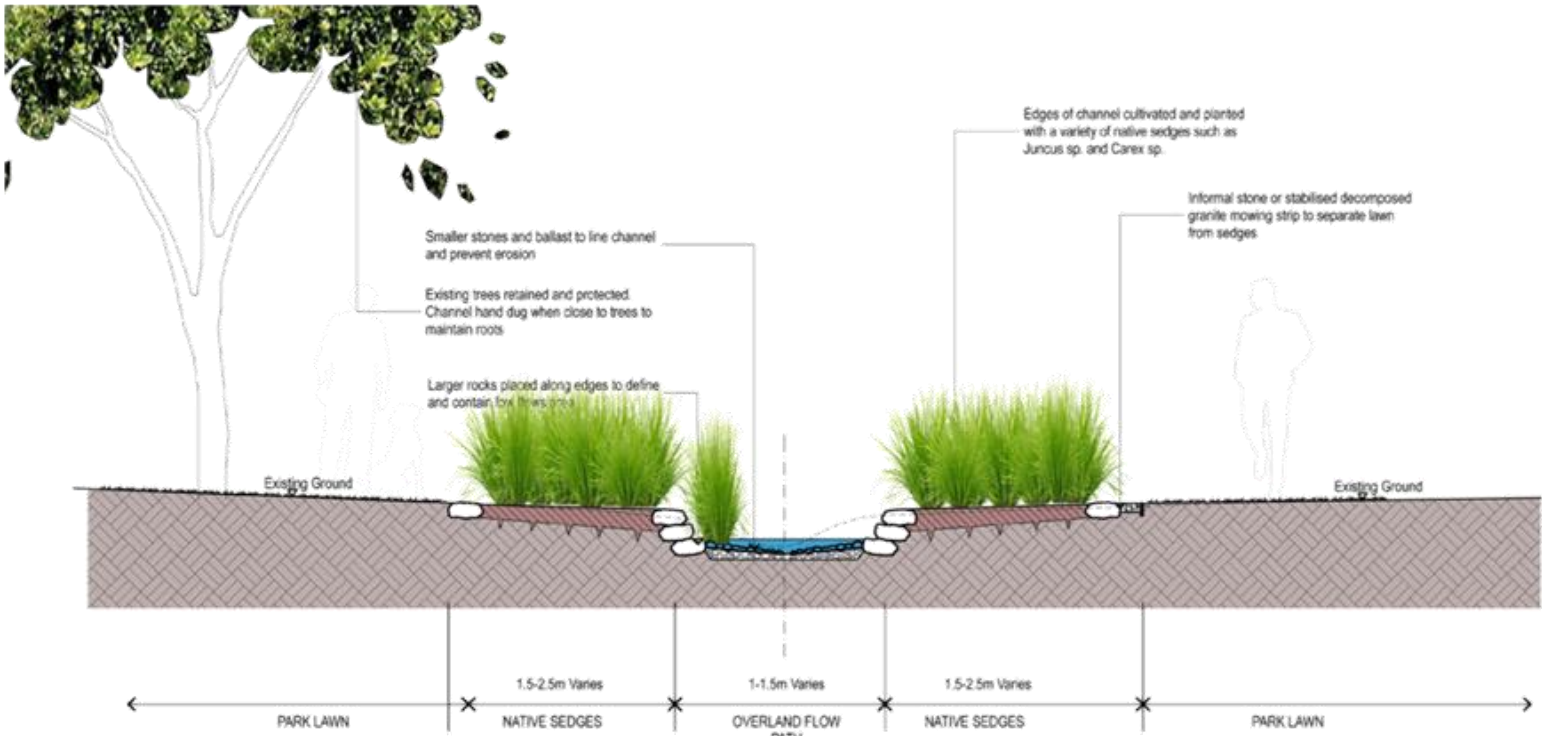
The proposed drainage channel treatment through the Memorial, Central and Lion Park
